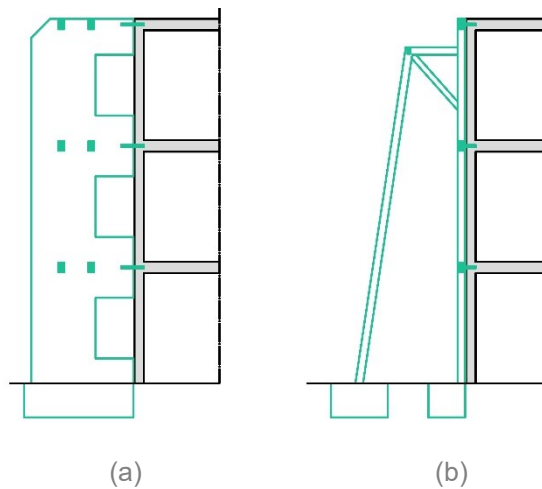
Stiffening systems using buttresses of RC walls (a) and steel beams (b).
